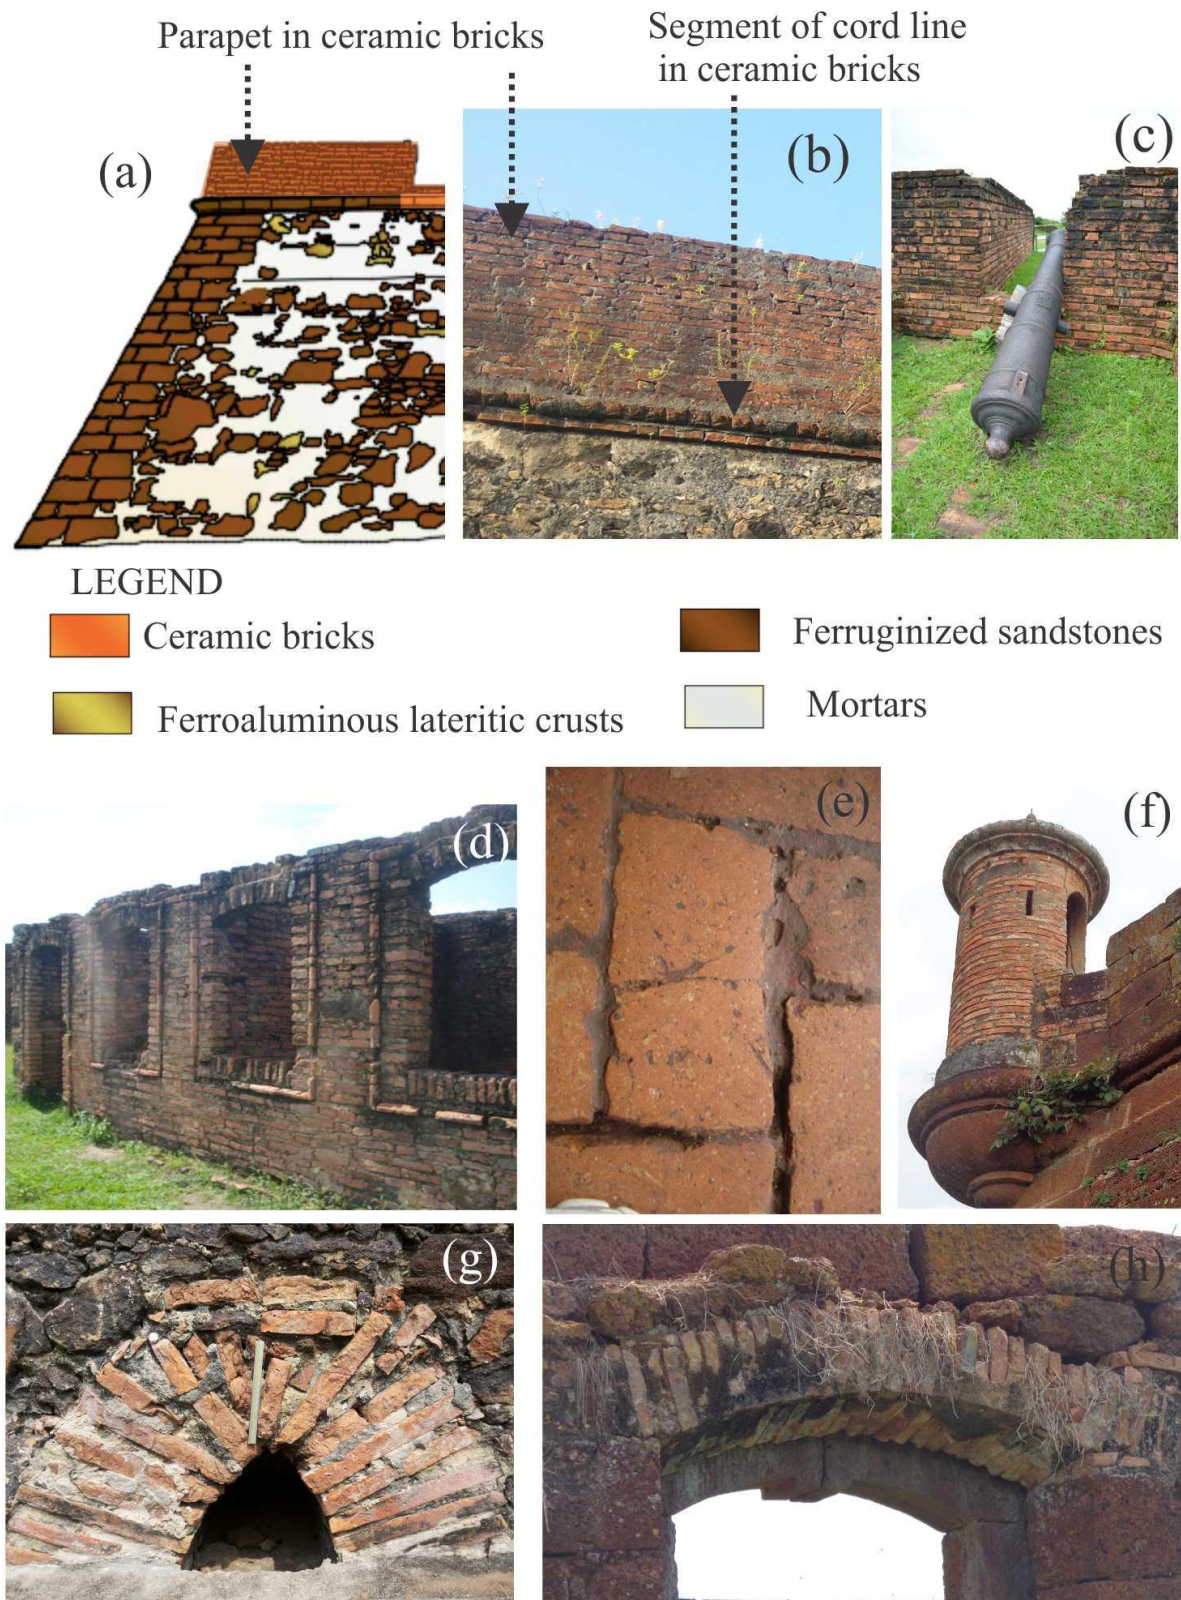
Main applications of ceramic bricks in the Amazon fortresses: (a) wall design of FSJM shows bricks in mixed masonry, parapet and gun ports; (b) parapet and cord line of wall in FSJM; (c) gun port in FSJM; (d) masonry in building of Ravelin in FSJM; (e) paving in access (sub-officers house) in FSJM; (f) sentinel box in RFPB; (g) drain in FCPB; (h) arch span in RFPB.
